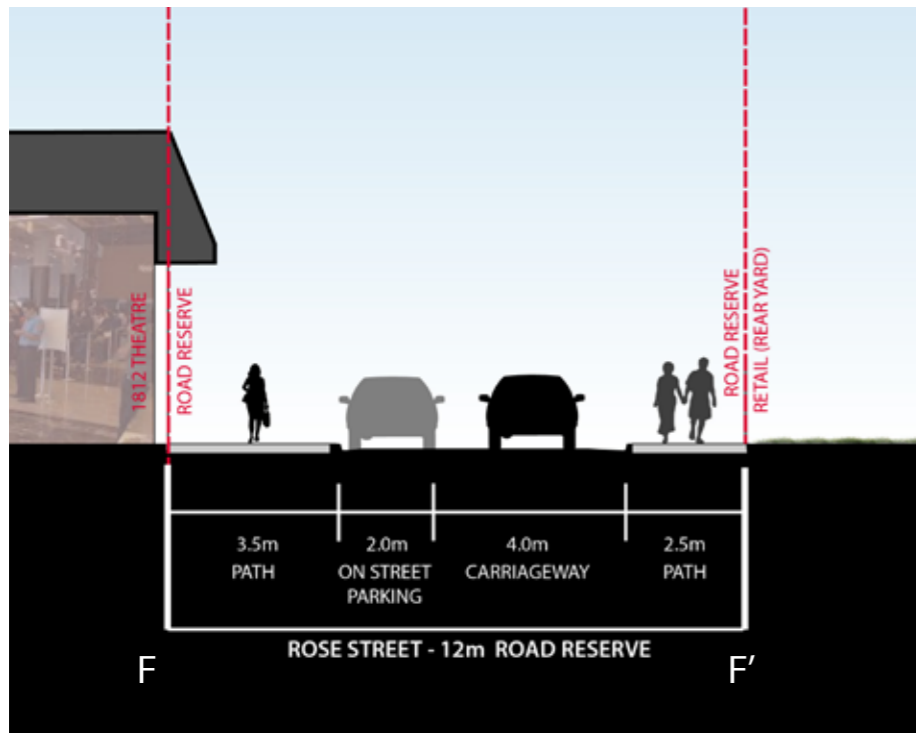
Cross Section F - F' - Rose Street - Near 1812 Theatre
